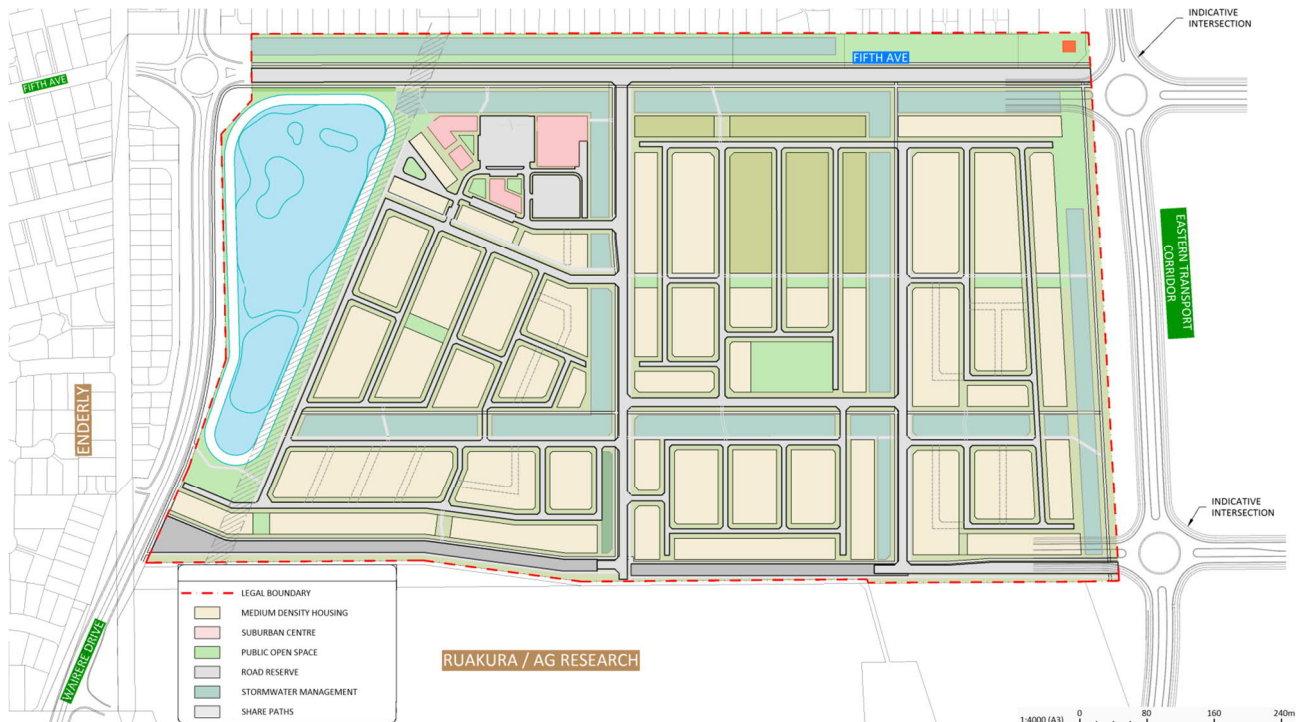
Ruakura Tuumata Concept Layout Plan General Arrangement
